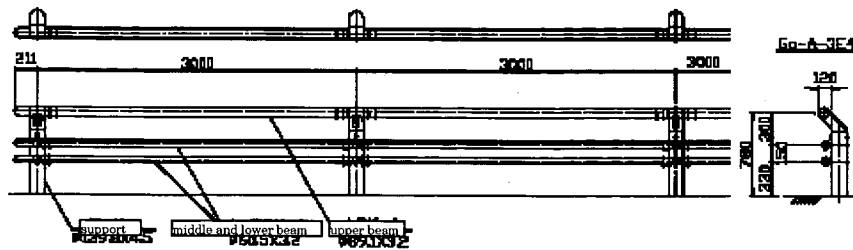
Structure of the test specimen (Test No.1,2,3)
